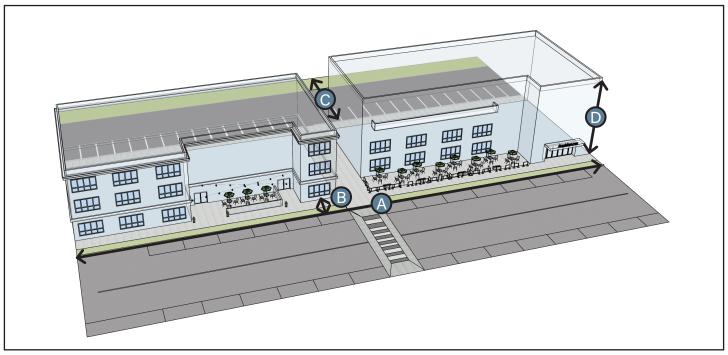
Graphic showing a potential development in NC. Note the zero-foot setbacks, outdoor dining patios, street parking with a raised mid-block crosswalk, and pedestrian alley between buildings to connect the street with rear parking. Street parking slows traffic and creates a barrier between moving vehicles and pedestrian ways.
